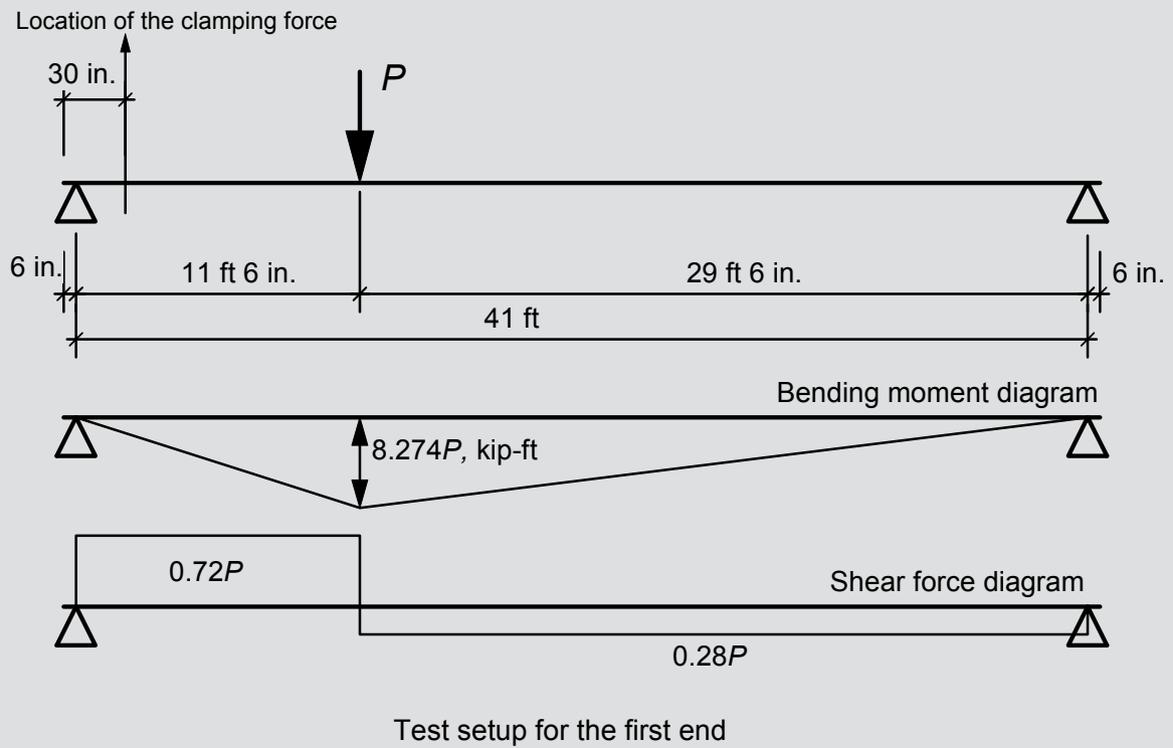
Support and loading arrangement of the full-scale specimens. Note: P = load. 1 in. = 25.4 mm; 1 ft = 0.305 m.
